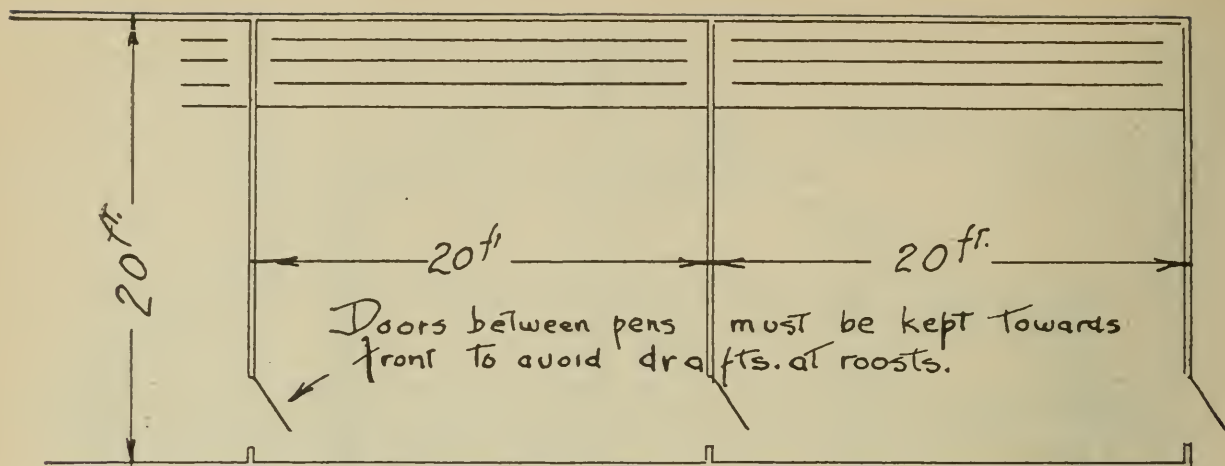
Showing floor plan arrangement for pens twenty feet square. And the location of partition doors. This idea may be adopted either in Figures 34 or 36.
